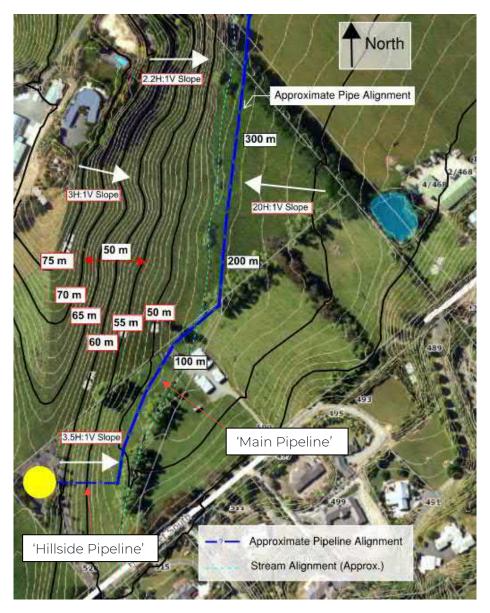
Approximate Richmond South Pipe Alignment (Southern Section & Reservoir Site)
